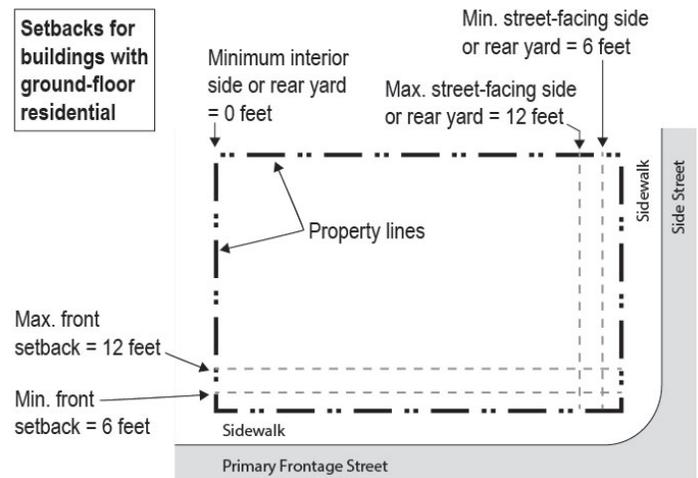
RC-BC Setbacks - with ground-floor residential
